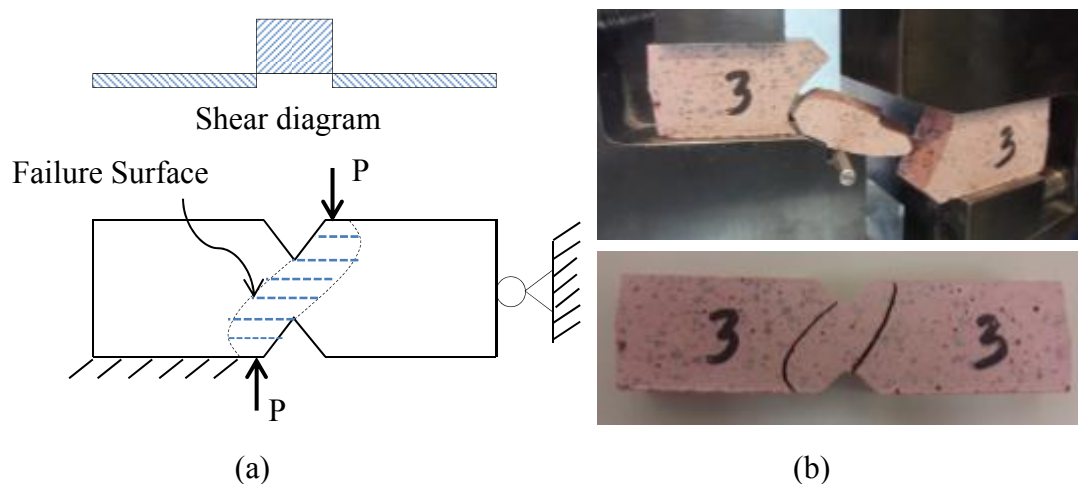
Typical shear specimens under loading; (a) shear behaviour and (b) failure in the shear specimens
